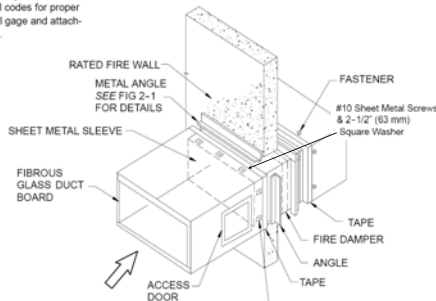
FIBROUS GLASS DUCT INSTALLATION
